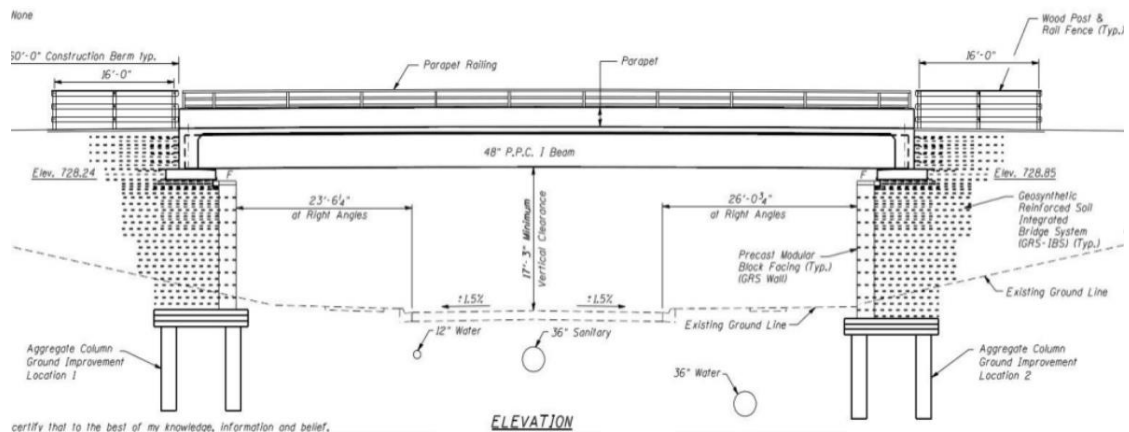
Elevation design plan for Village of Lombard Bridge (Wahab et al. 2015)
